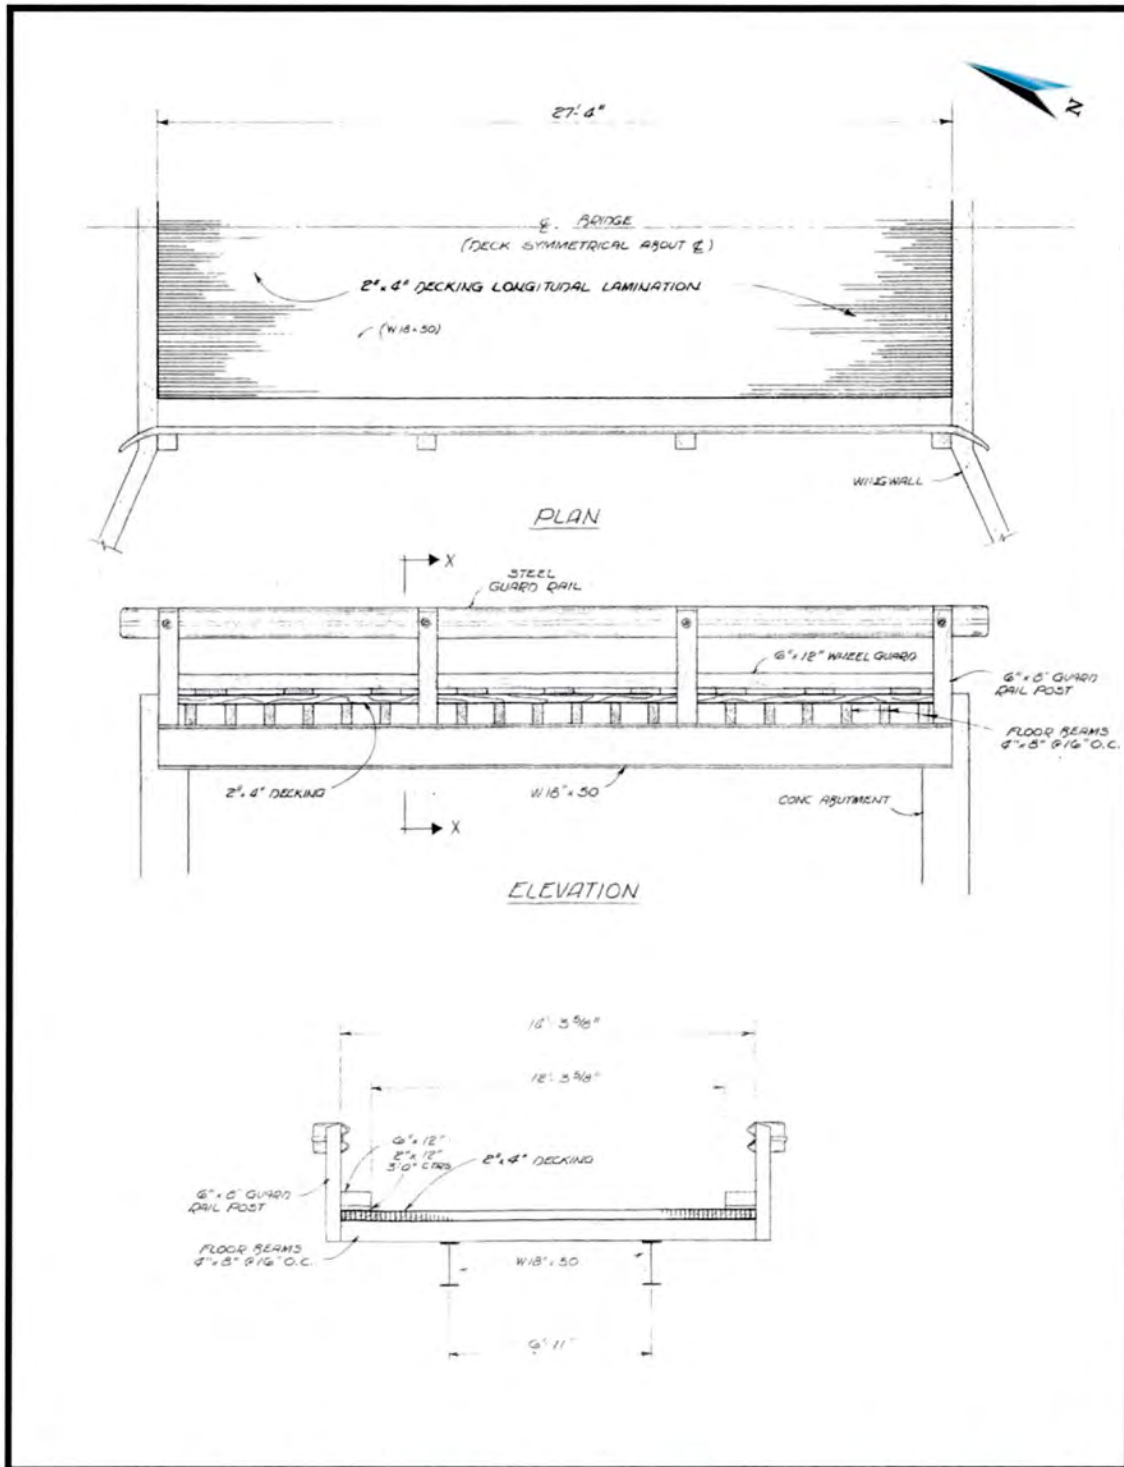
Plan (top), profile (middle), and cross-section (btm) drawings of Bridge 140-1.5 on Courthouse Creek. Courtesy of USFS Engineering.
